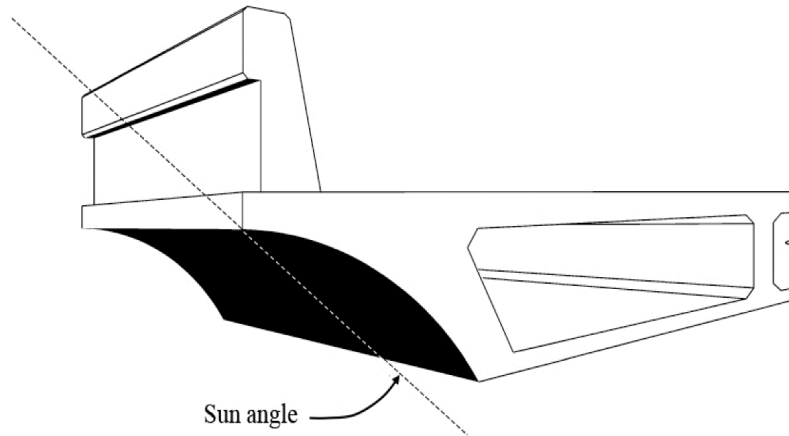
Shadow on Concave Hammerhead Box Girder
